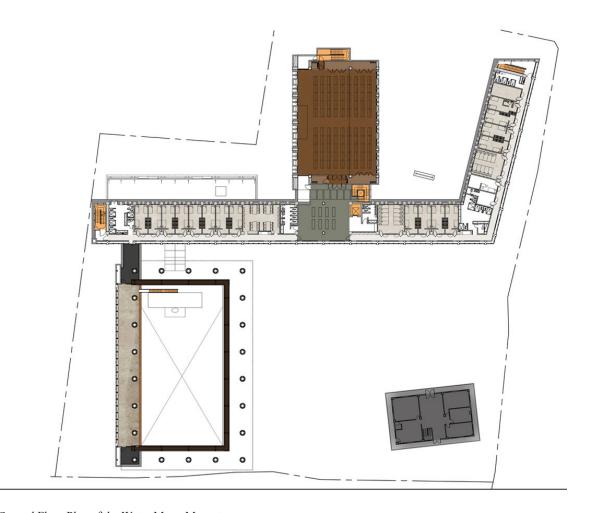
Second Floor Plan of the Water-Moon Monastery
